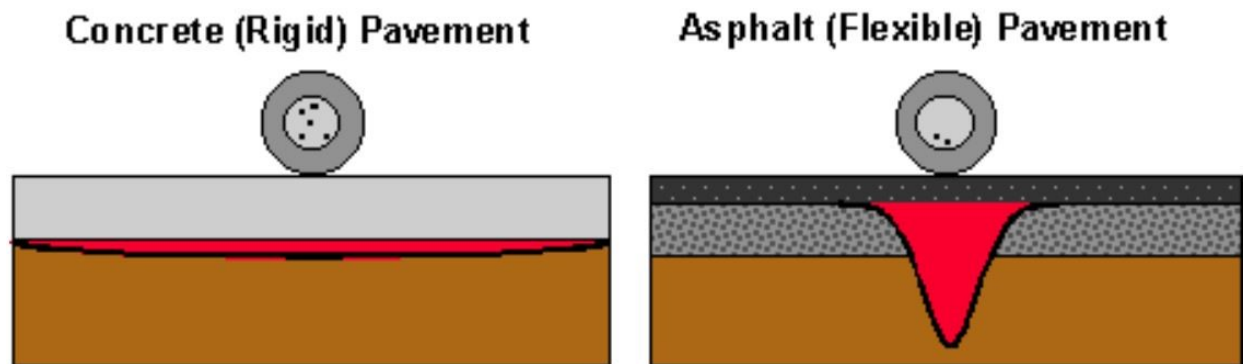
Load distribution mechanisms of rigid and flexible pavements [http://overlays.acpa.org/Concrete_Pavement/Technical/Fundamentals/Differences_Between_Concrete_and_Aspalt.asp (date accessed: January 23, 2021)].
